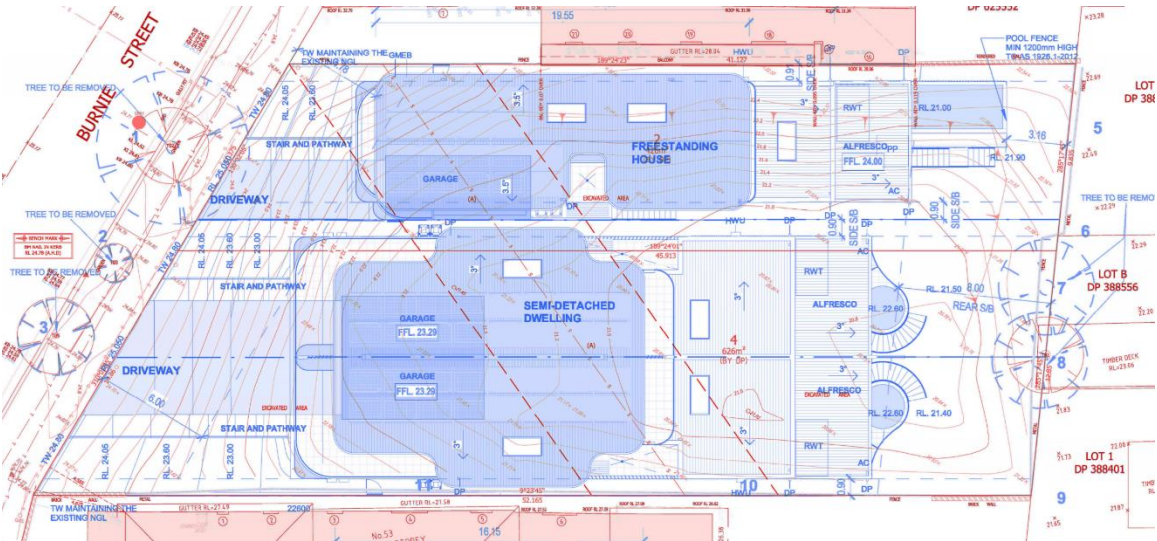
Overlay of proposed roof plan (blue) and survey plan (red)
